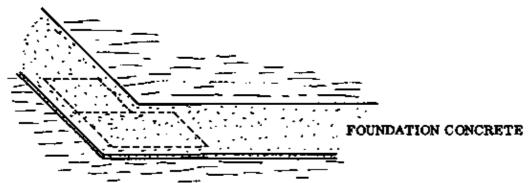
SETTING OUT THE FOOTINGS (ENLARGED DETAIL)
